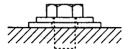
B.11 Vertical anchor capacity for concrete or masonry wall.<sup>23</sup>
